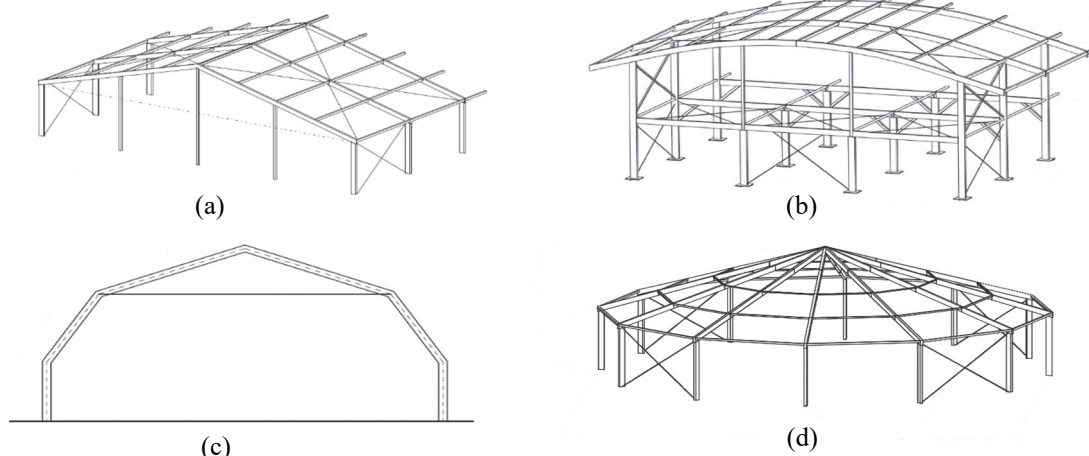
Main structural systems: (a) portal frame with straight beams; (b) portal frame with curved beams; (c) polygonal frames; (d) half-frames in radial array [10]
